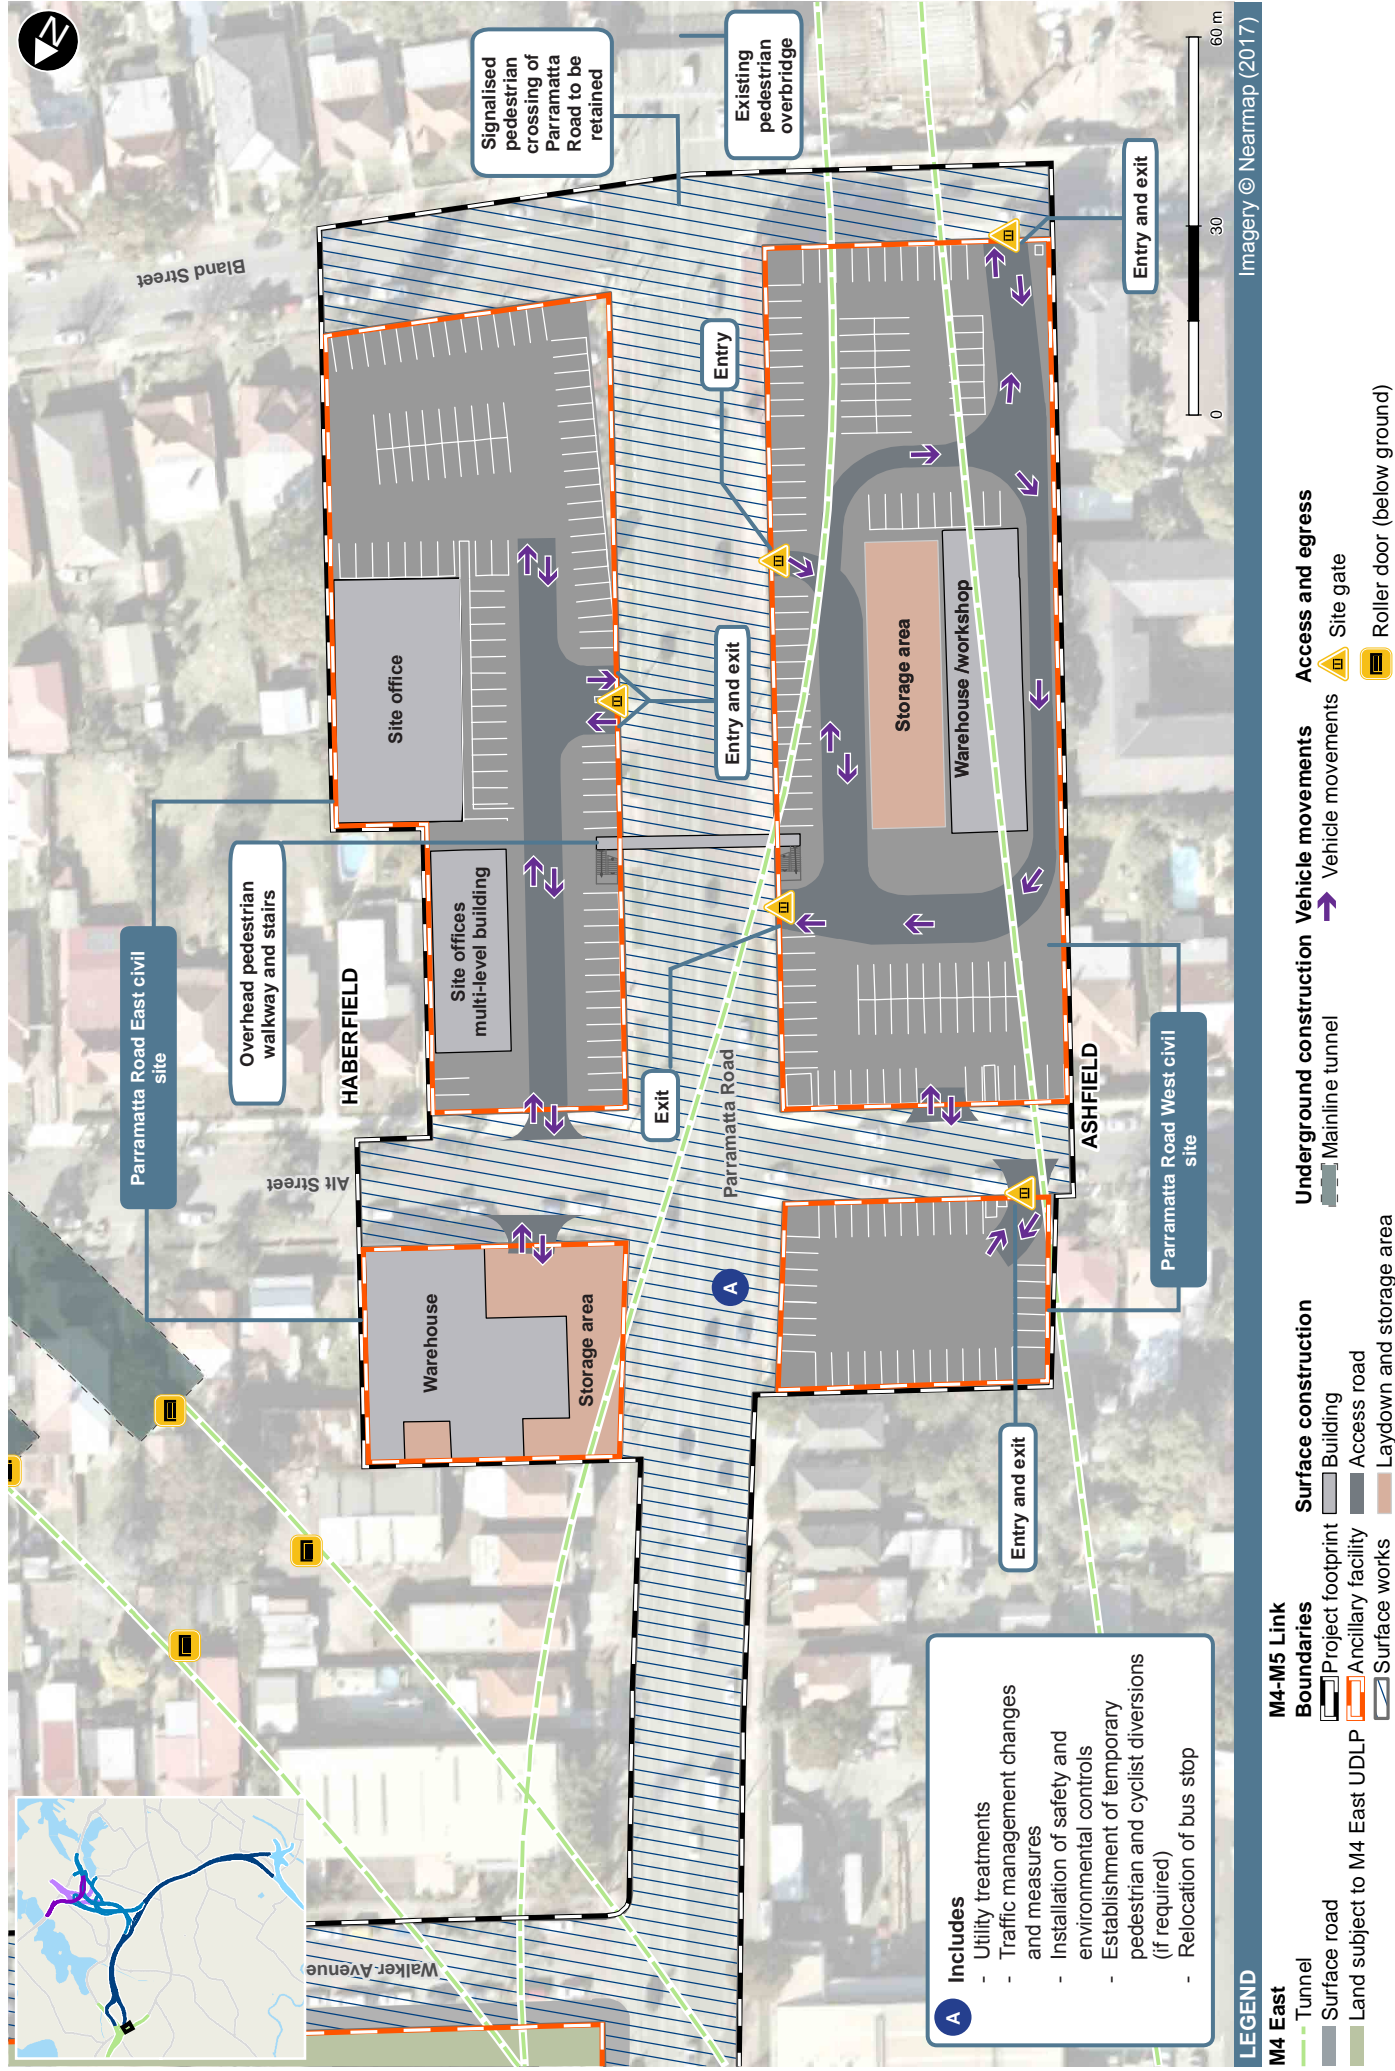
Indicative Parramatta Road West and Parramatta Road East sites layouts
